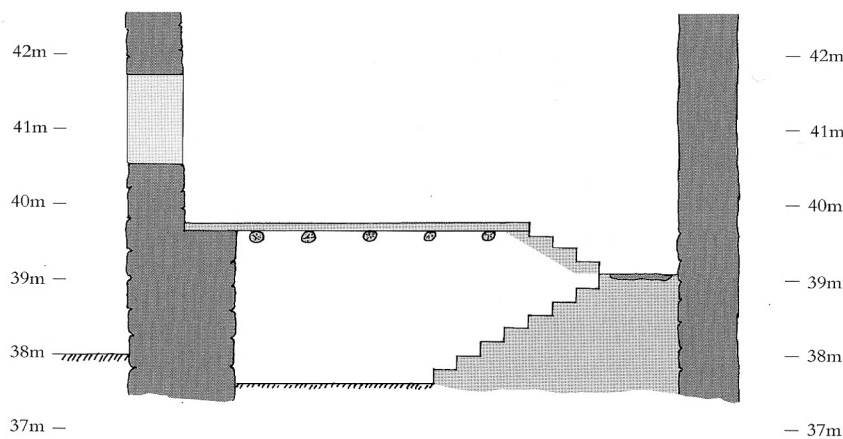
Conjectural reconstruction of staircase and floor of archive room.
